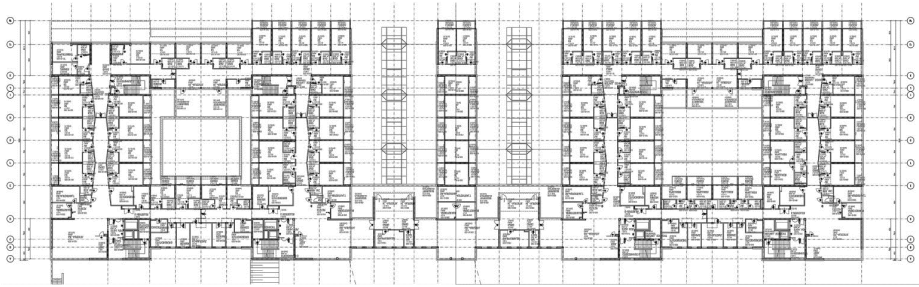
Floor plan of the Alzheimer's center (1st floor)
